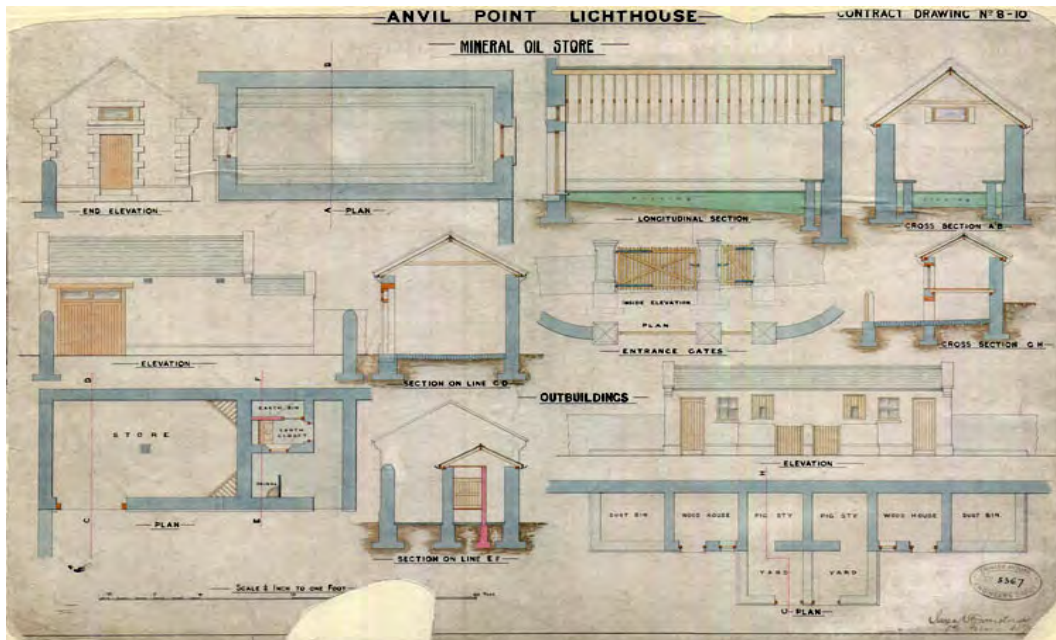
The original plans of the Outbuildings at Anvil Point Lighthouse
